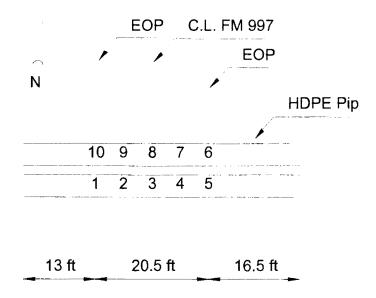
Plan View of Installation A2 in Atlanta District.
